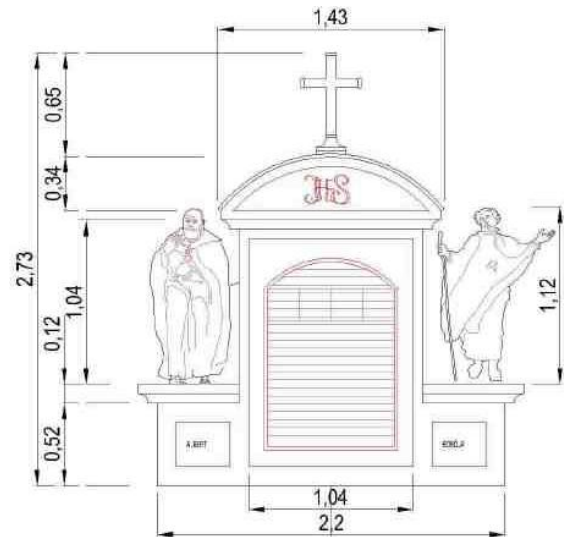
Arrangement of top part of main column C4 – exhaust of ventilation chimney, with sculptures - figures of Saints Brother Albert and Andrzej Bobola, A4.
